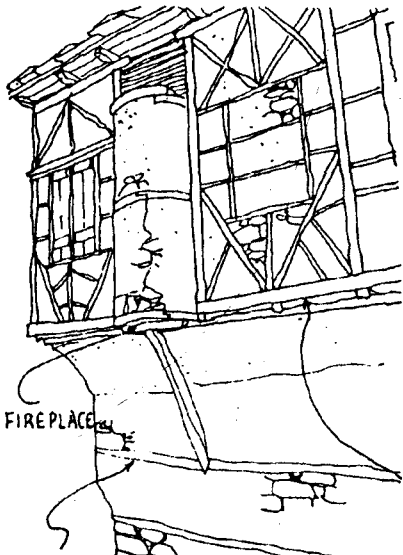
CONNECTION OF THE WALLS AT THE CORNERS OF THE BUILDING.
